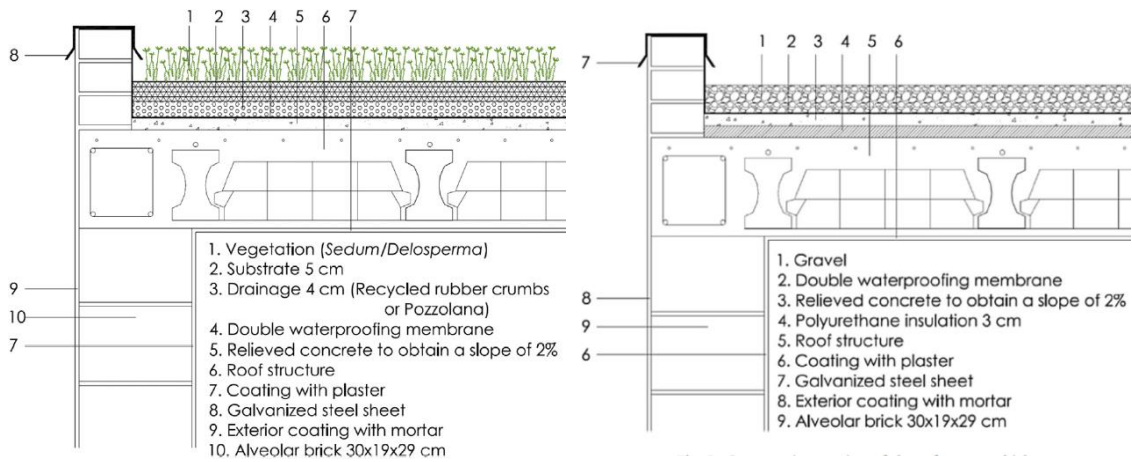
Construction section of green roof cubicles (left) and construction section of the reference cubicle (right)
